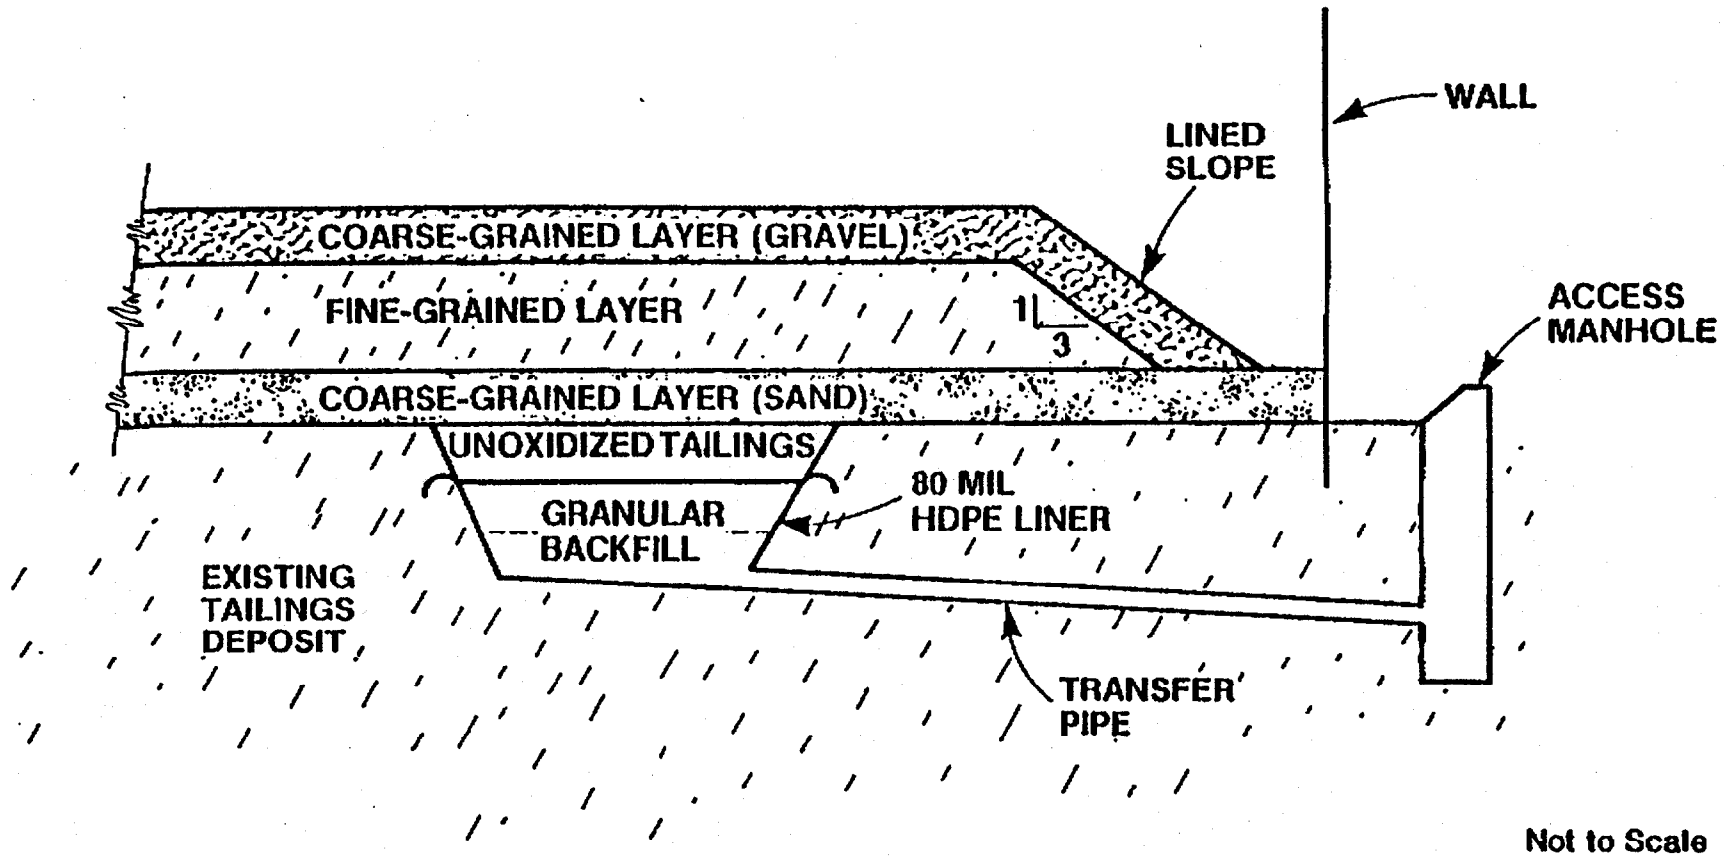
Longitudinal Section B-B' of Tests Plots Showing Lysimeter and Access Manhole for Sampling.
